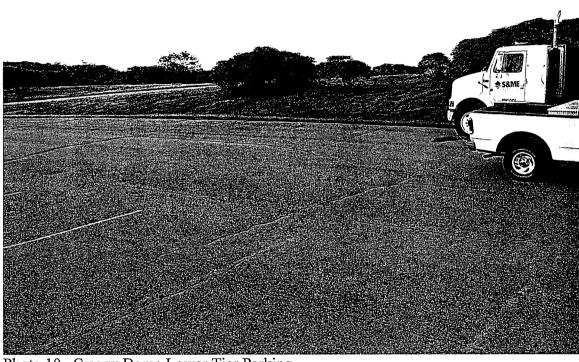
Craggy Dome Lower Tier Parking Thermal Cracking
